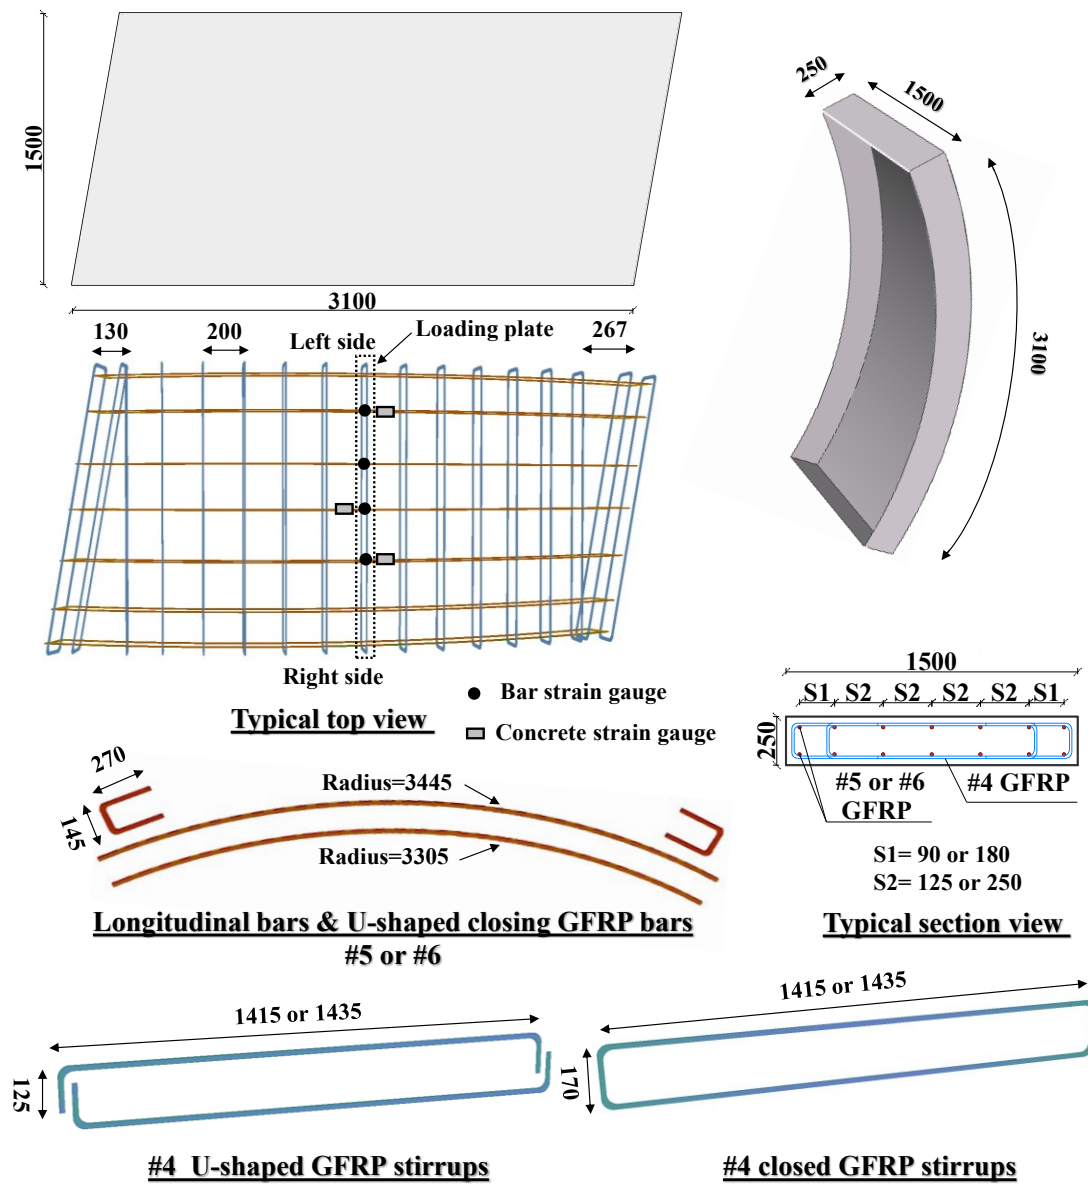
Specimen geometry and reinforcement details (dimensions in mm).
